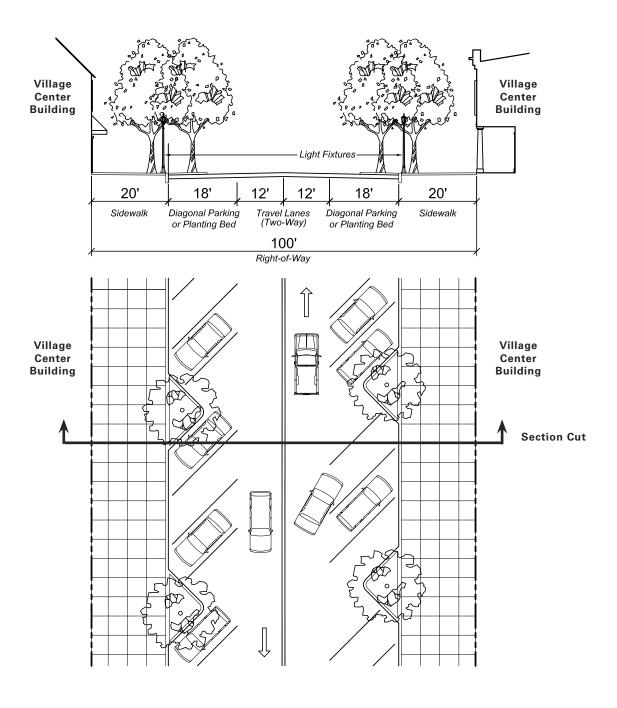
Proposed Section and Plan: Village Center Street A (Alternate)
